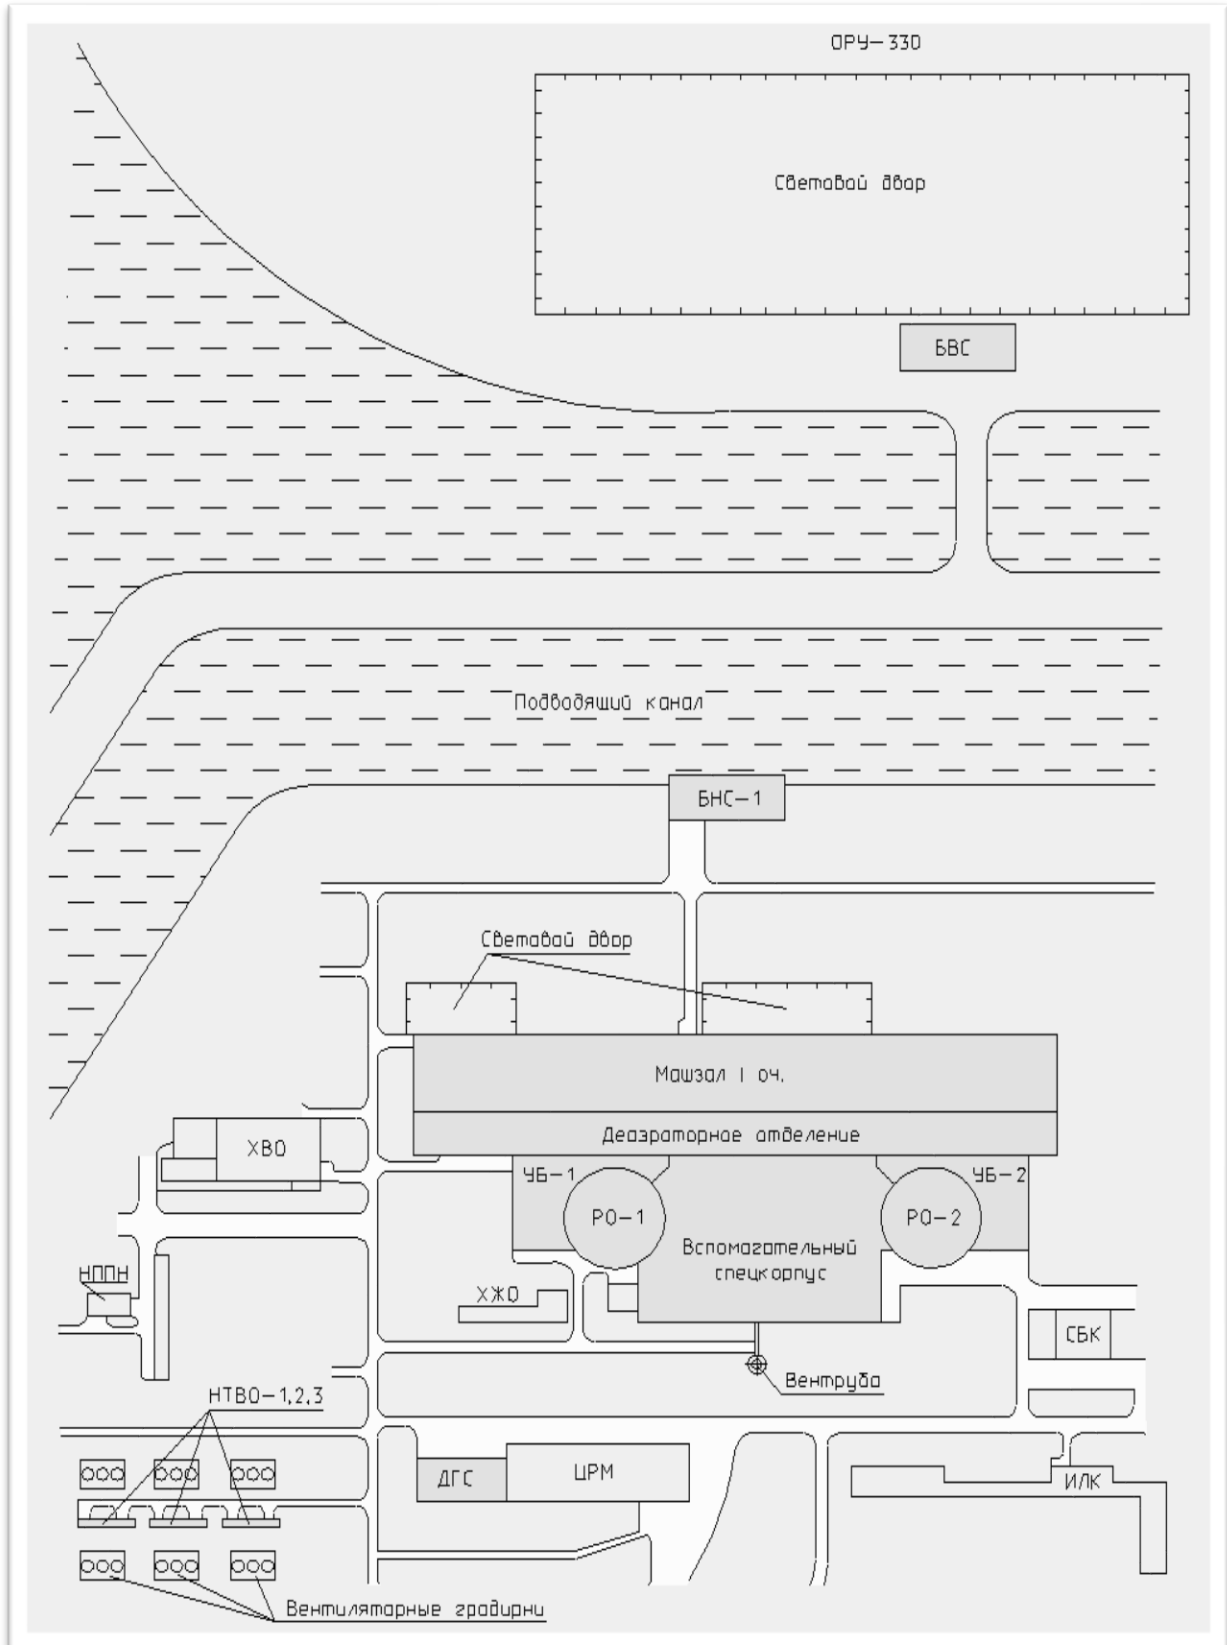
Layout of the main buildings and structures of the PNPP first stage
